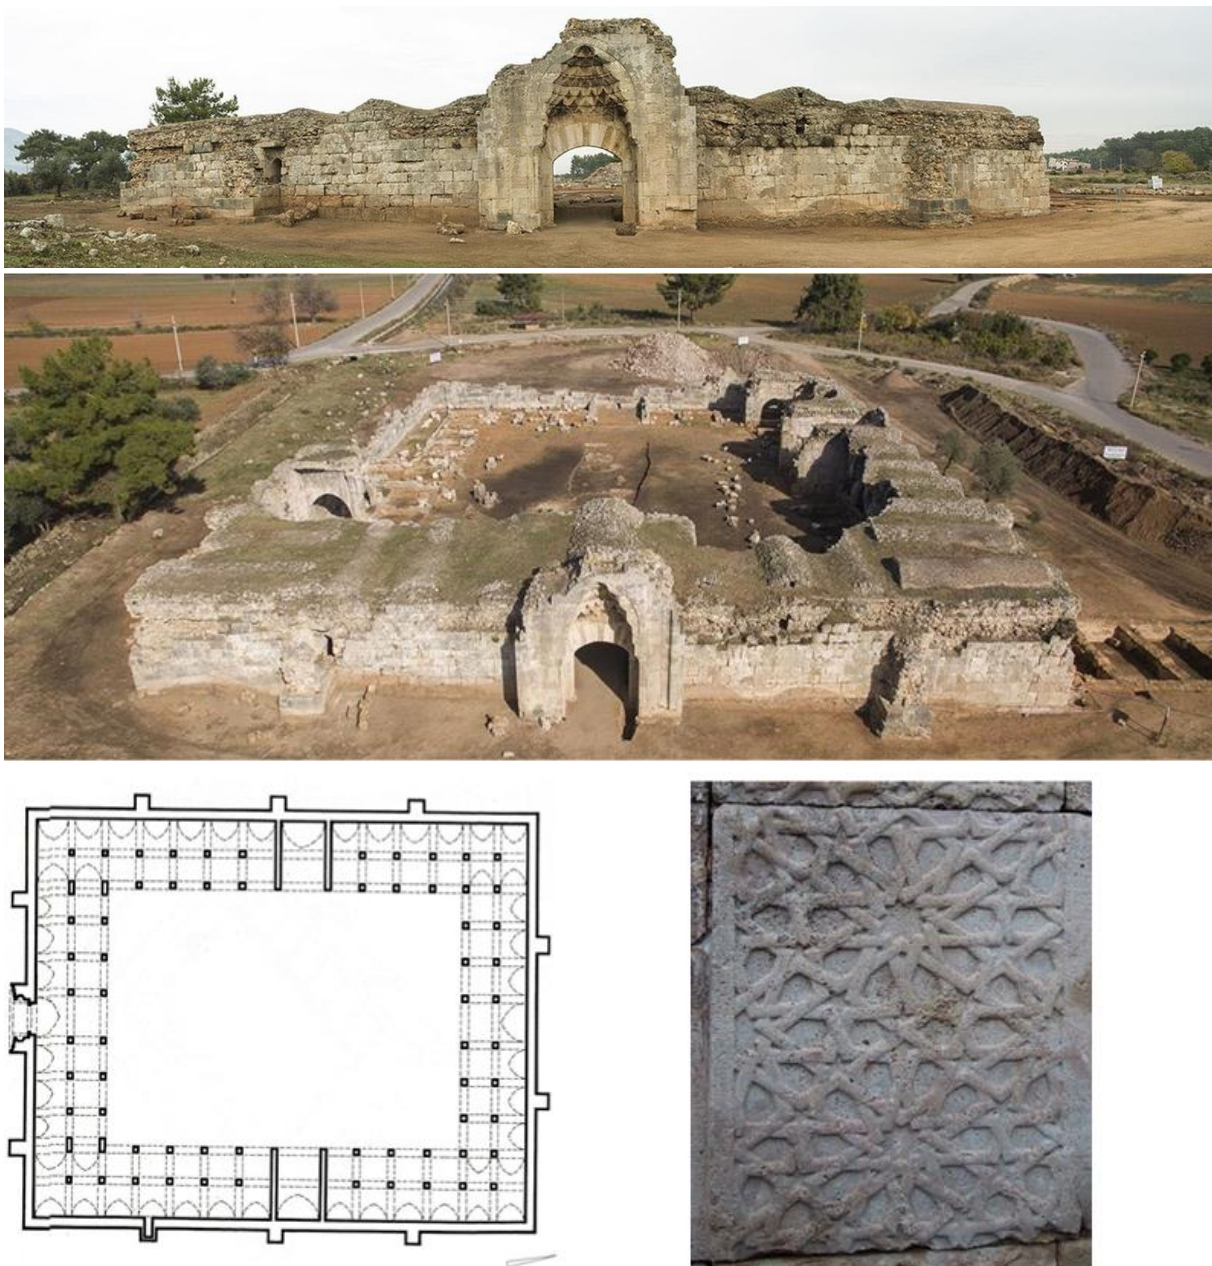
Plan and façade and a border detail of Evdir Han (Inn) between Antalya-Isparta in South-East Anatolia (19)
